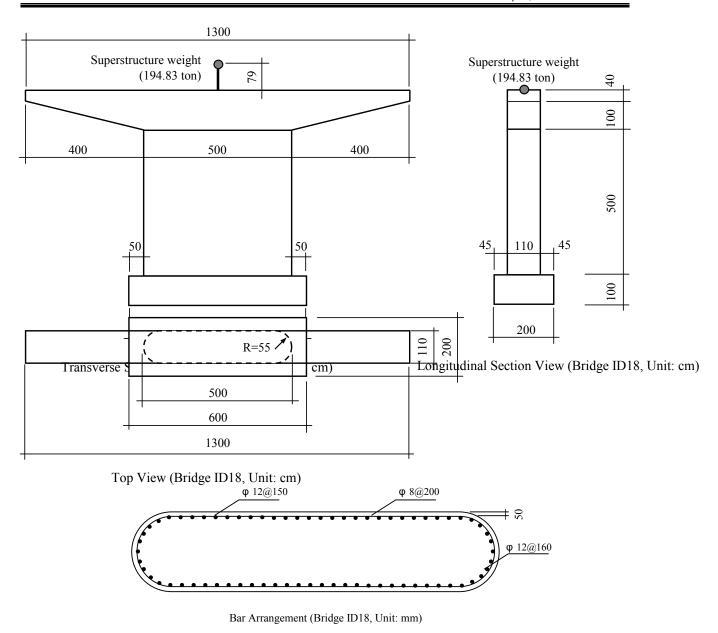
Dimension of bridge pier and bar arrangement (Bridge No.18)
